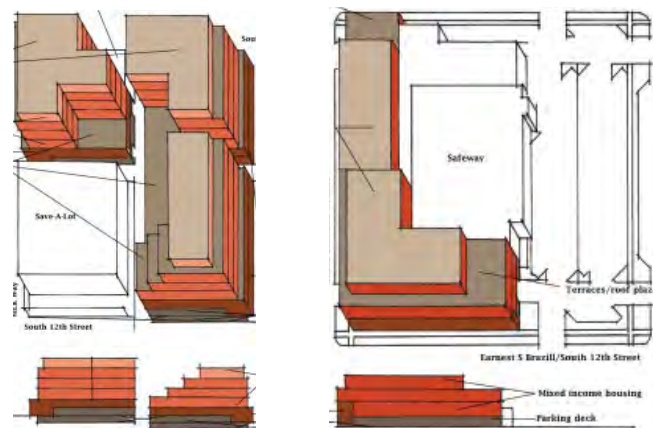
Left* - Visioning study for the northwest corner of MLK Jr Way and South Earnest Brazill Street. *Above* - Envelope studies on potential development sites at the MLKHDA site at MLK Jr Way and South 11th Street, the Browne's Star Grill/Pochert Building site at MLK Jr Way and South 12th Street, the former Save-a-Lot surface parking lots, and the Safeway (see Appendix K of the Draft Hilltop Subarea Plan for details on the envelope studies).
